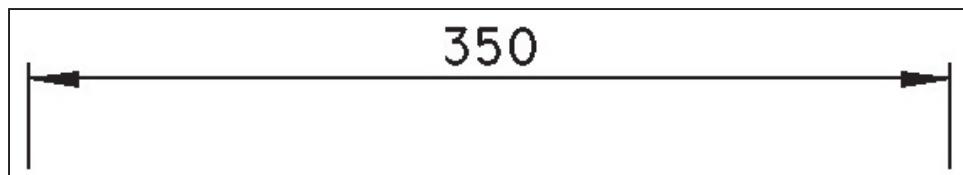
Dimension in millimeters. Always shown as a whole number.
